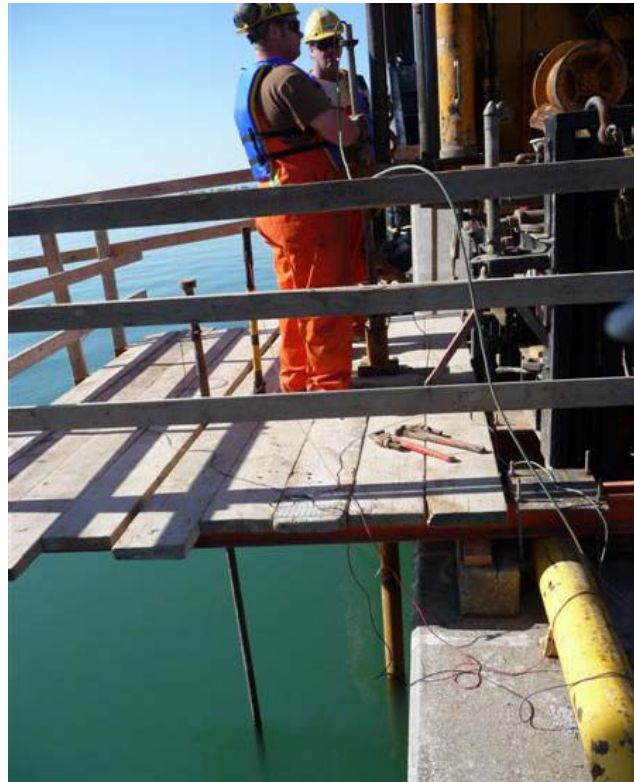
CPT(u) and shear wave rods cantilevered over the dock
